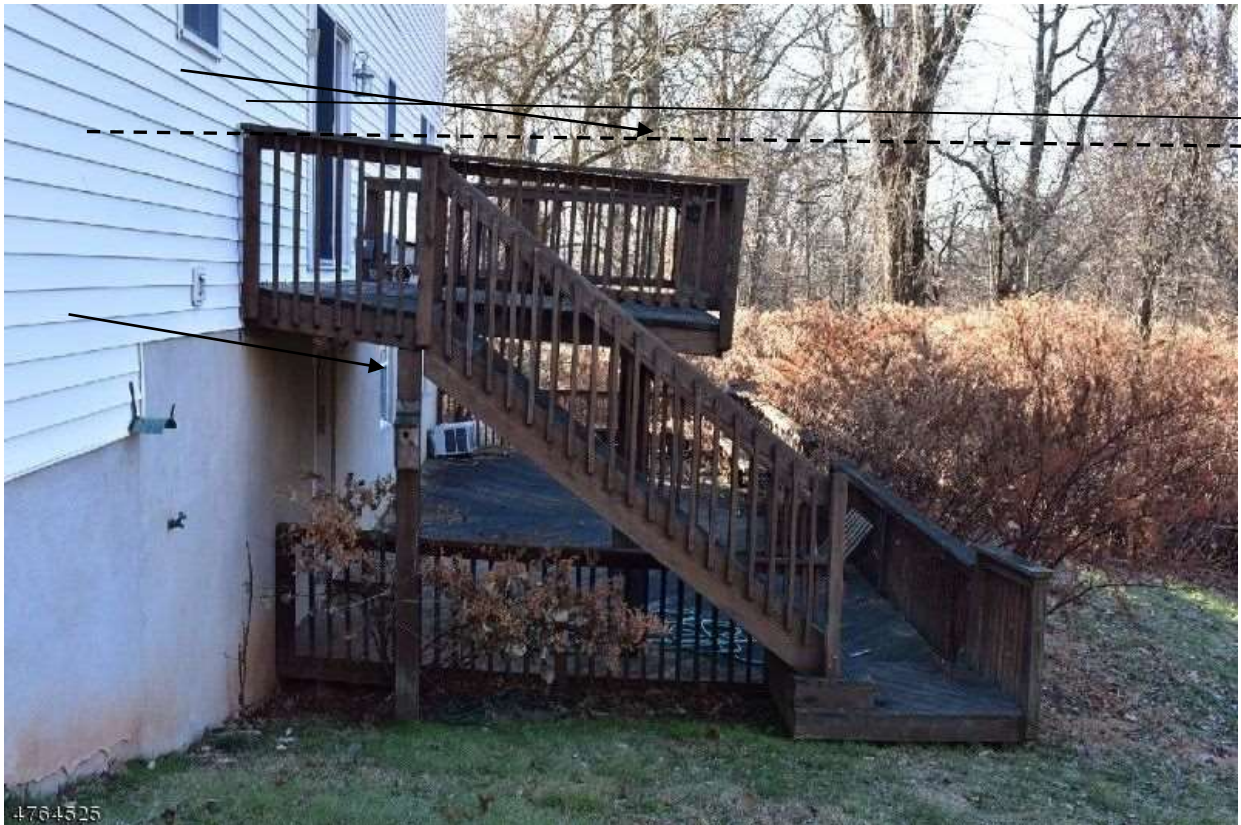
Lower deck sinking and built on grade or soil and upper deck and steps are sloping and pulling away from house; dangerous.
